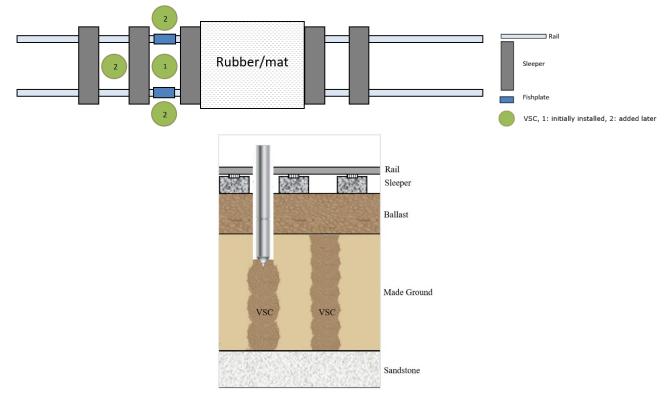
Schematic of dry vibro-replacement method for stabilizing trackbeds with stone columns; plan view (top) and section view (bottom).
